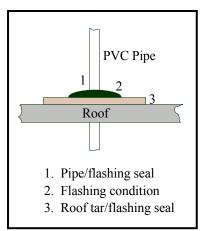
Components to inspect in an SSD system roof flashing assembly.
